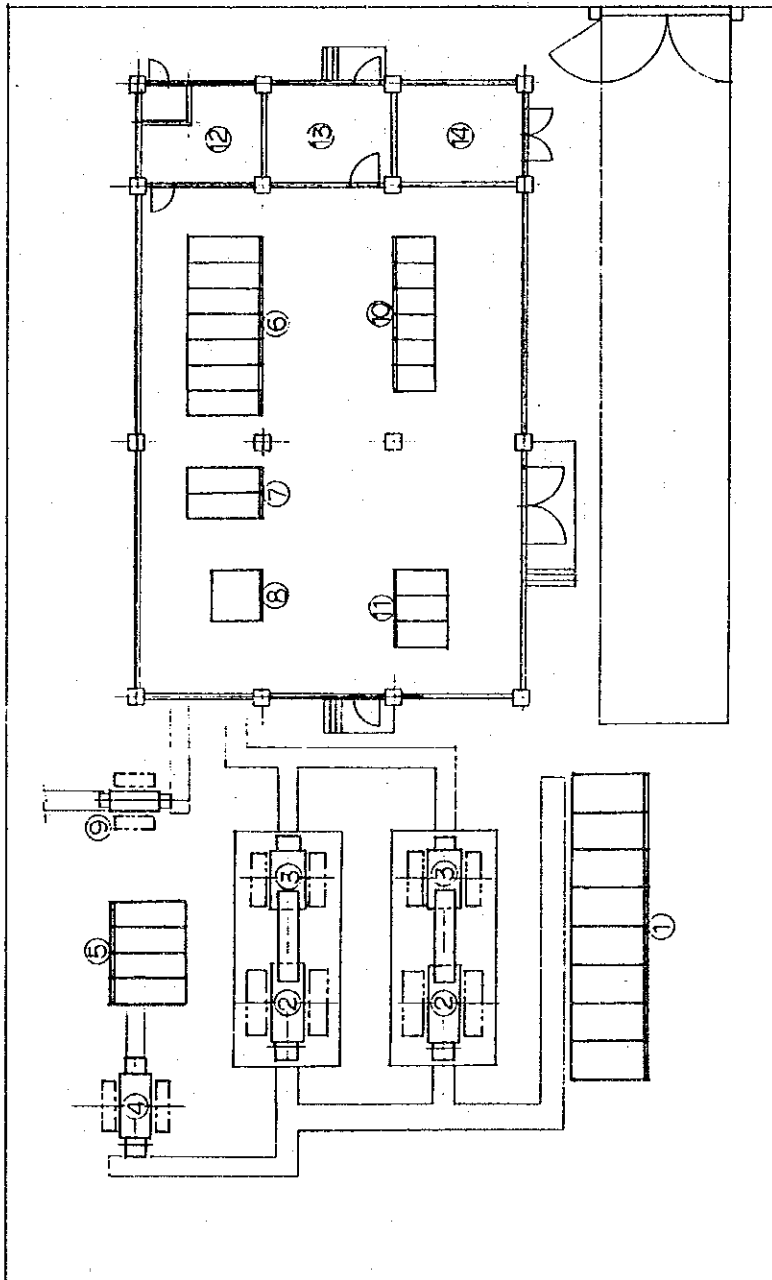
Substation Layout Plan (No. 4 Substation)
